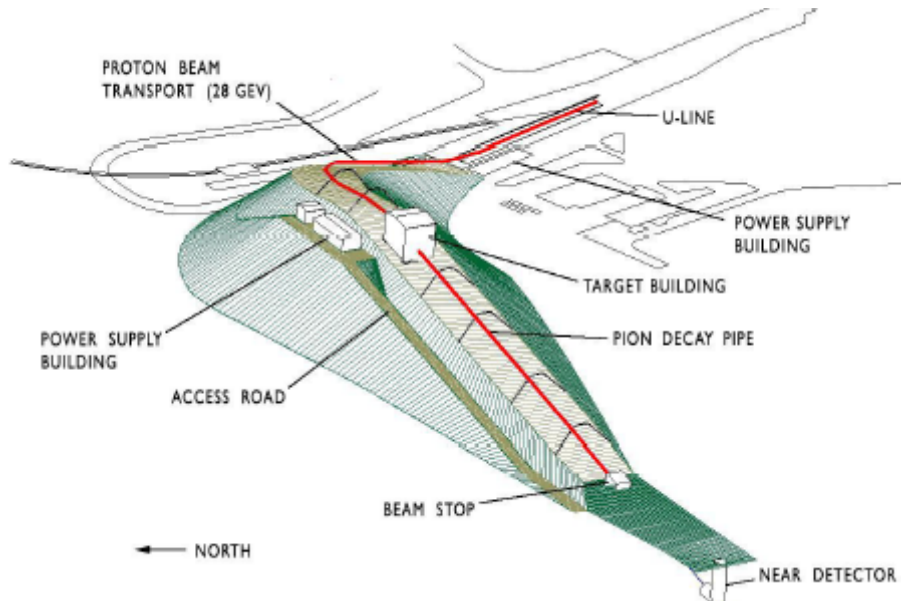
3-dimensional view of the neutrino beamline. The beamline is shown without shielding on top of the beam-line magnets and the decay tunnel.
